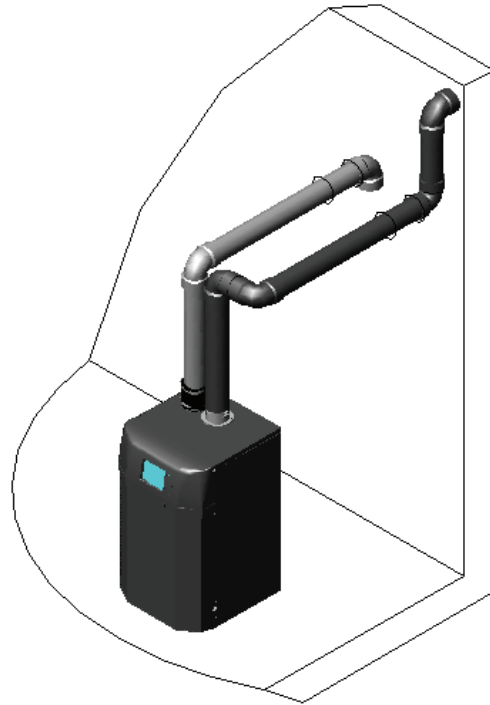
(a) Two-Pipe Sidewall Termination (NX800 Illustrated)
